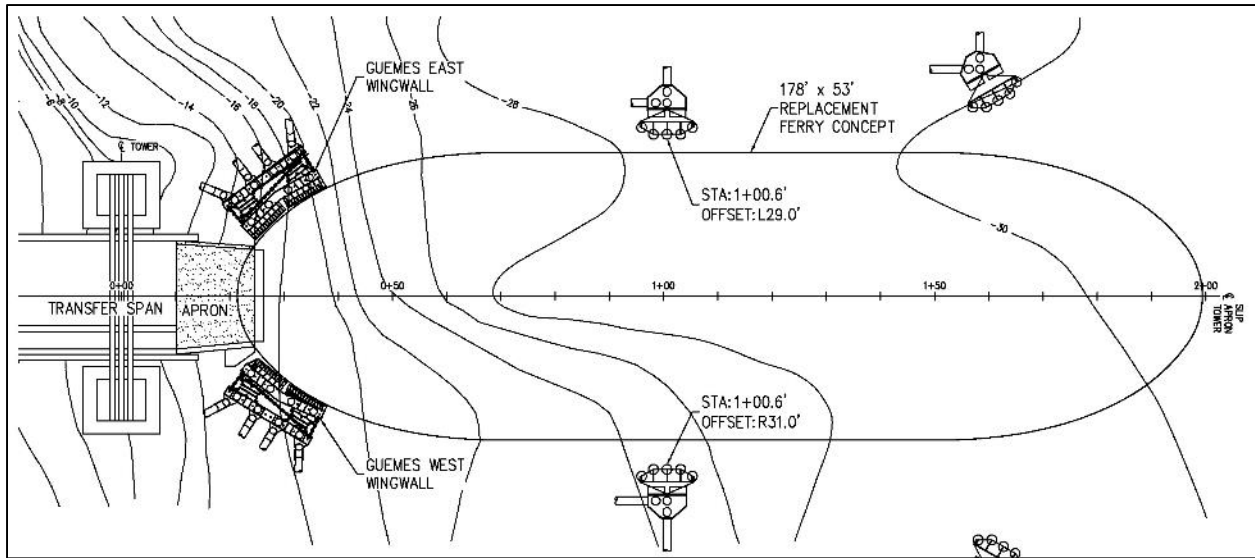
Guemes Island terminal: as-built plan view and outline of 178' x 53' replacement ferry concept (Source: PND Report; see Appendix A for complete as-built drawings)
